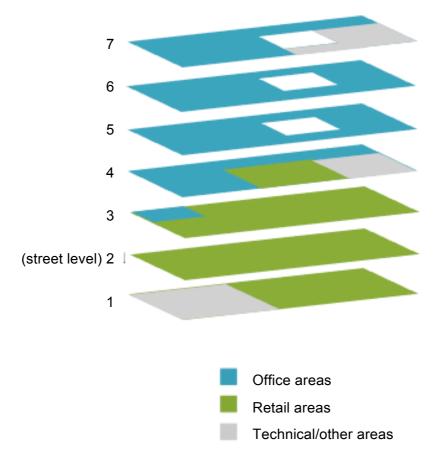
Principal sketch of the distribution of retail and office areas on each floor in the building.
